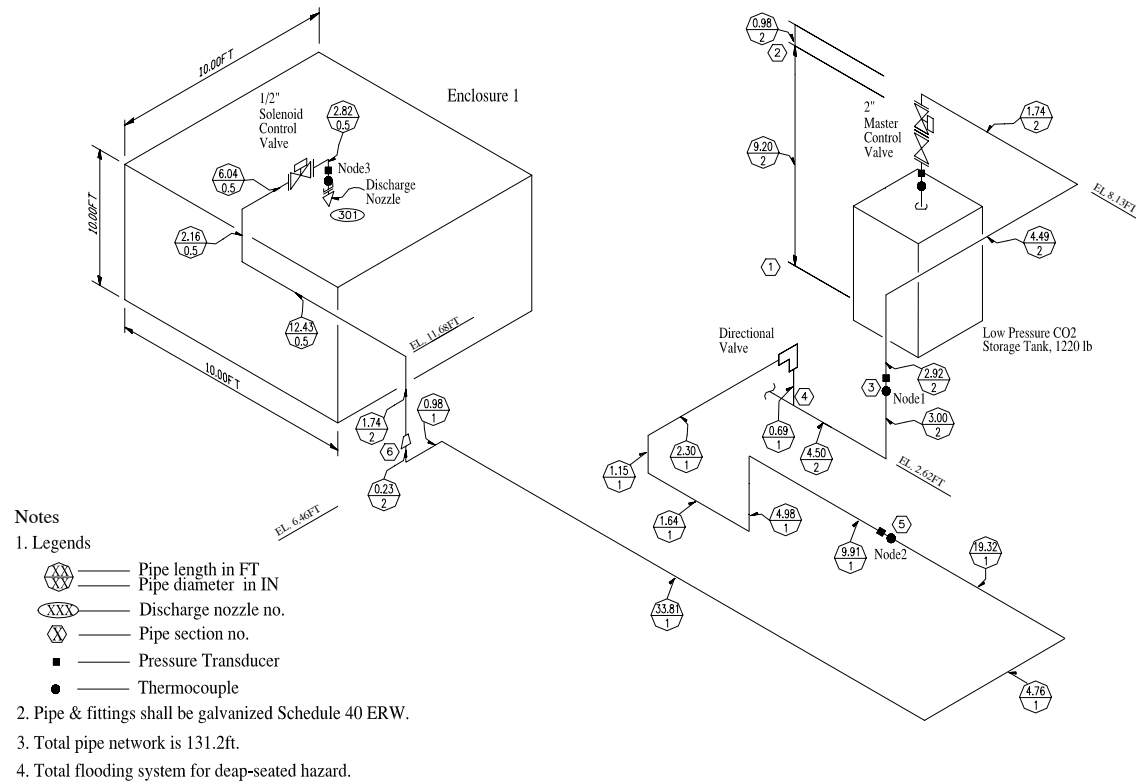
Isometric Piping Diagram for Test No. 2
